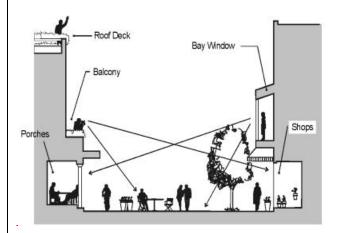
(E): Example of how building facades and the outdoor space complement each other. (The building facade has balconics, bay windows, decks, etc.)
